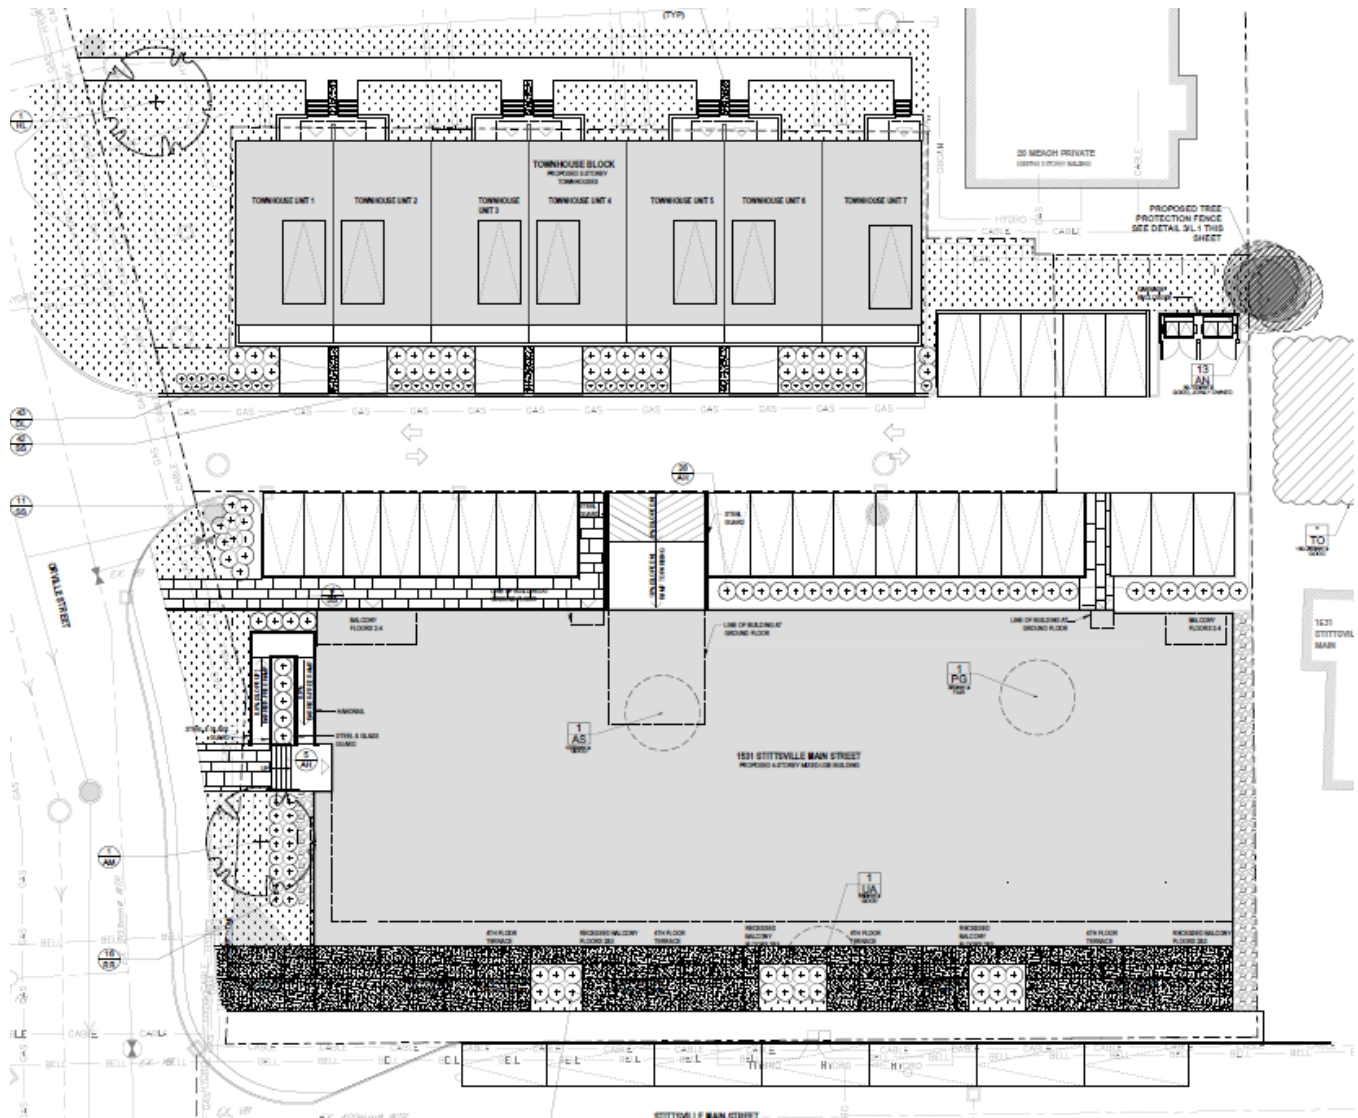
Landscape Plan for 1531 Stittsville Main Street
